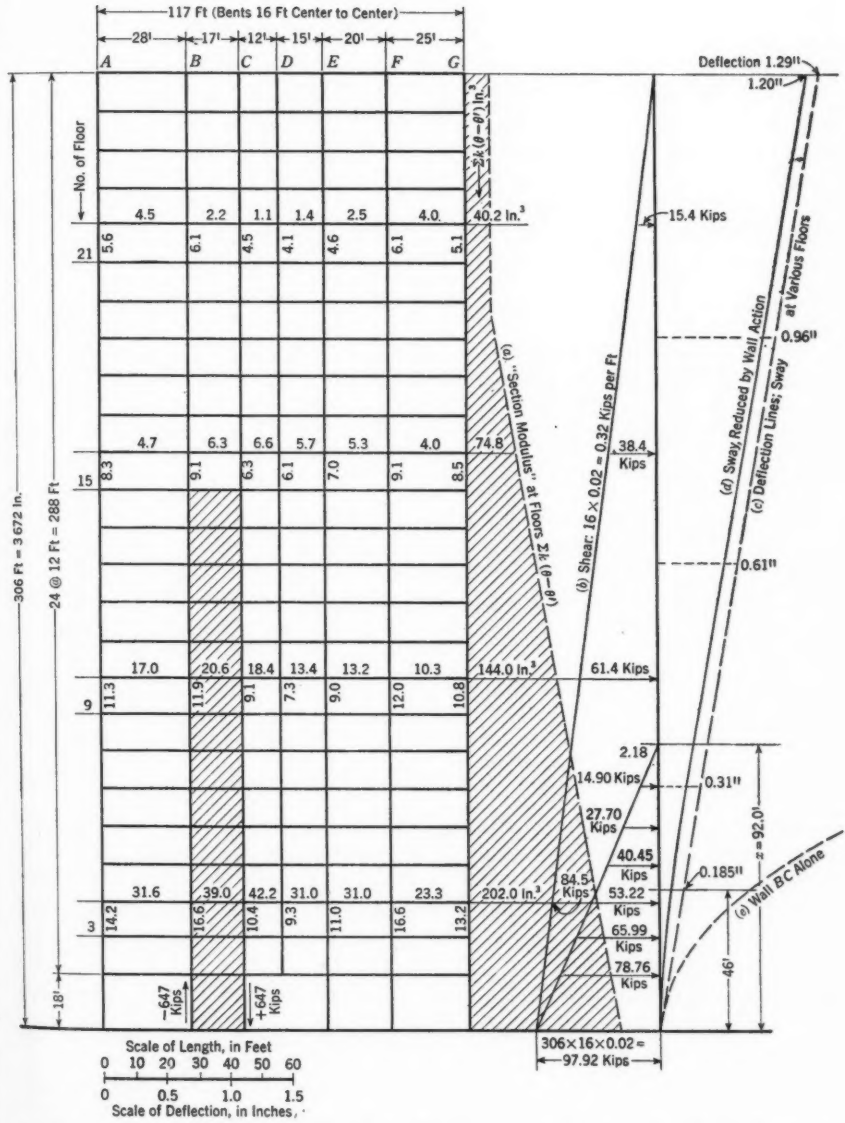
DIAGRAMS OF "SECTION MODULUS" AND DEFLECTION FOR A TWENTY-FIVE STORY BENT WITH A "WALL" BAY
